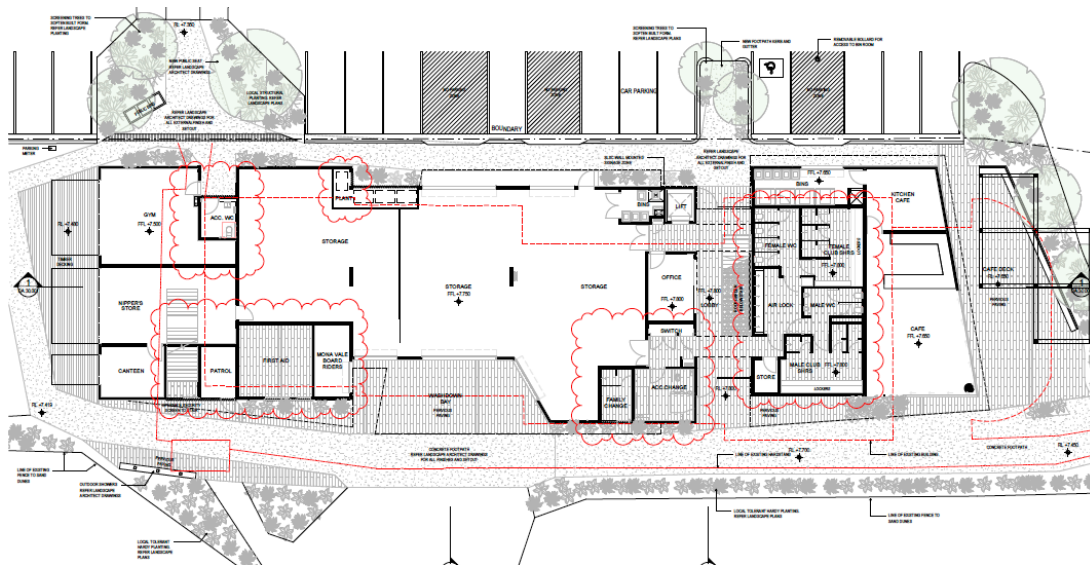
GA Plan – Ground Level (A.DA.10.001)
